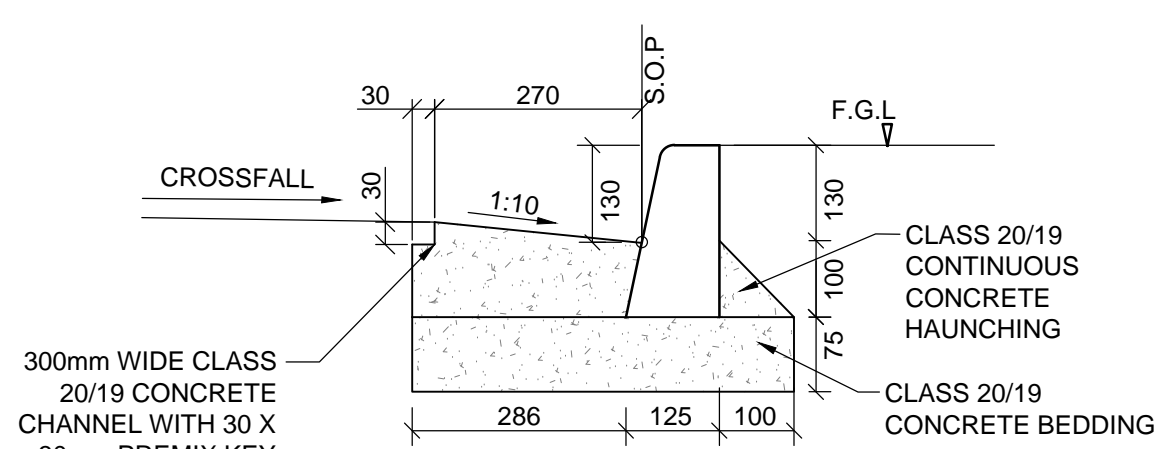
KERB WITH 270mm WIDE CHANNEL DETAIL
